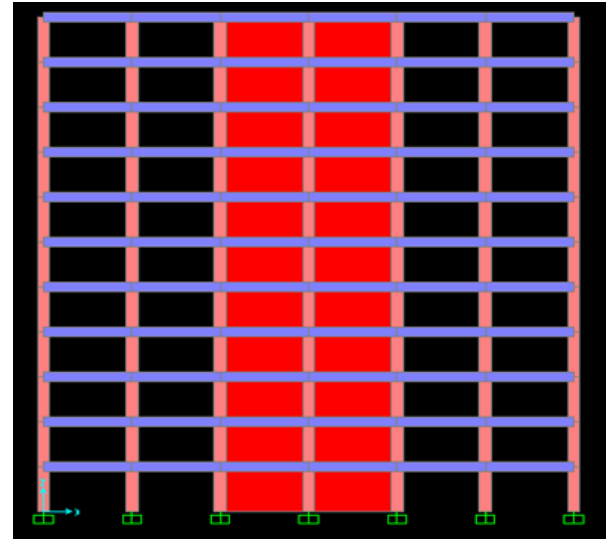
Building model with shear walls provided symmetrically in plan on plane ground.
